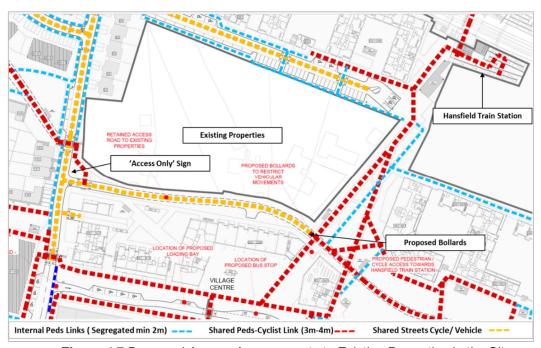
Proposed Access Arrangements to Existing Properties in the Site
